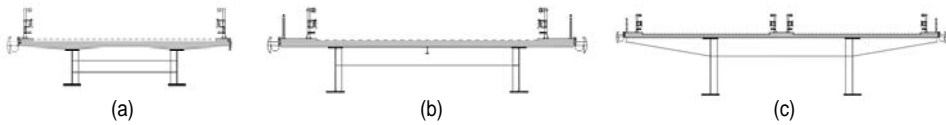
(a) Twin girder deck; (b) twin girder directly supporting cross-beams without cantilevers and (c) twin girder directly supporting cross-beam with cantilevers.
